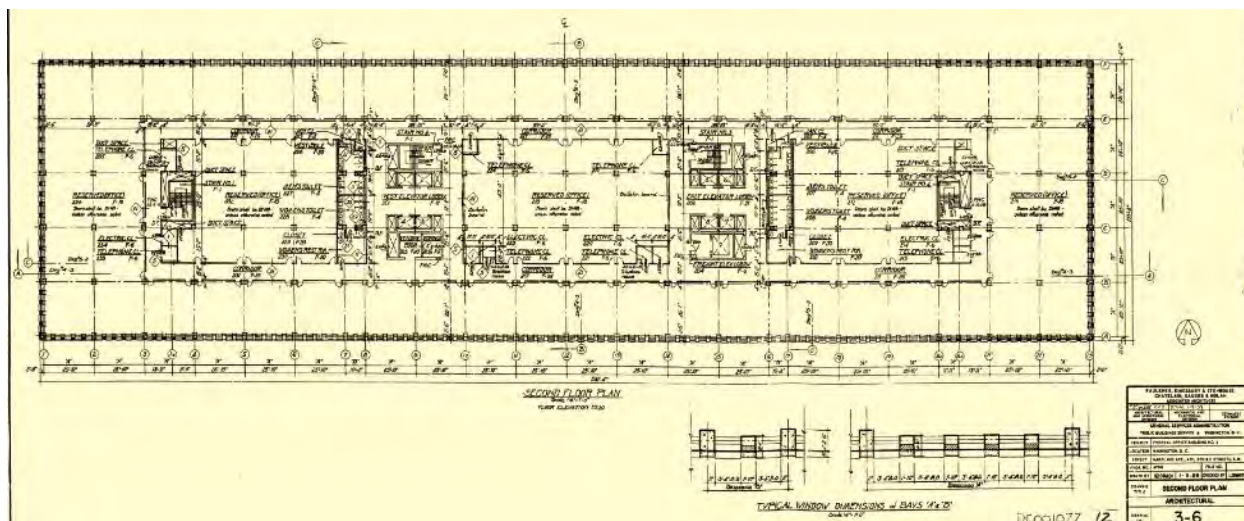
Detail, Second Floor Plan, January 9, 1959. Source: GSA NCR Technical Library.
